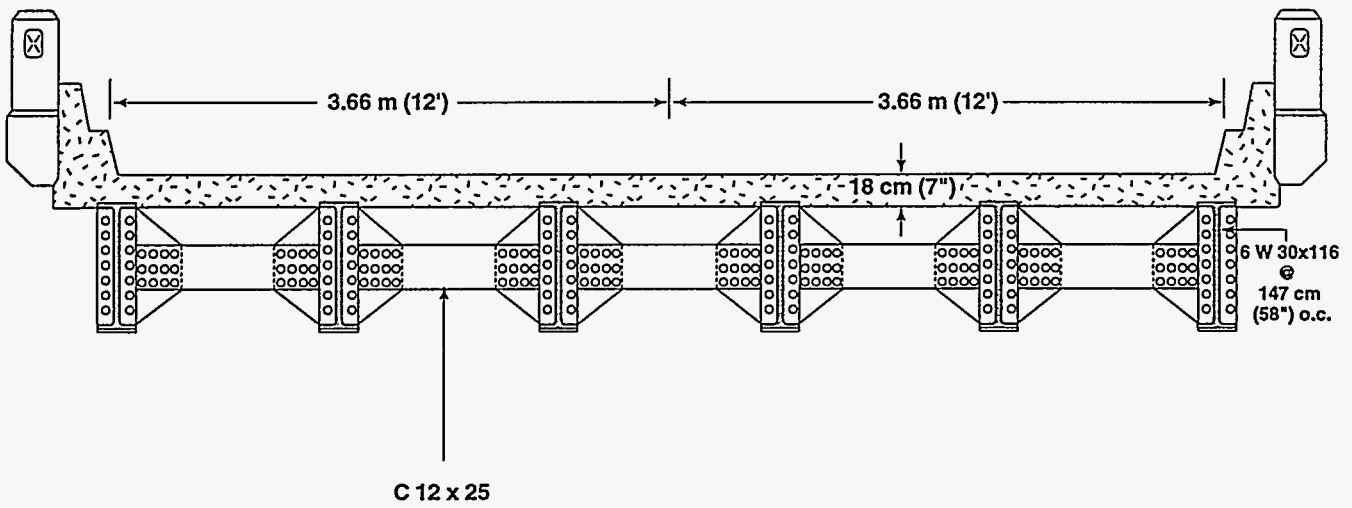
Cross-section view of the Alamosa Canyon Bridge.
